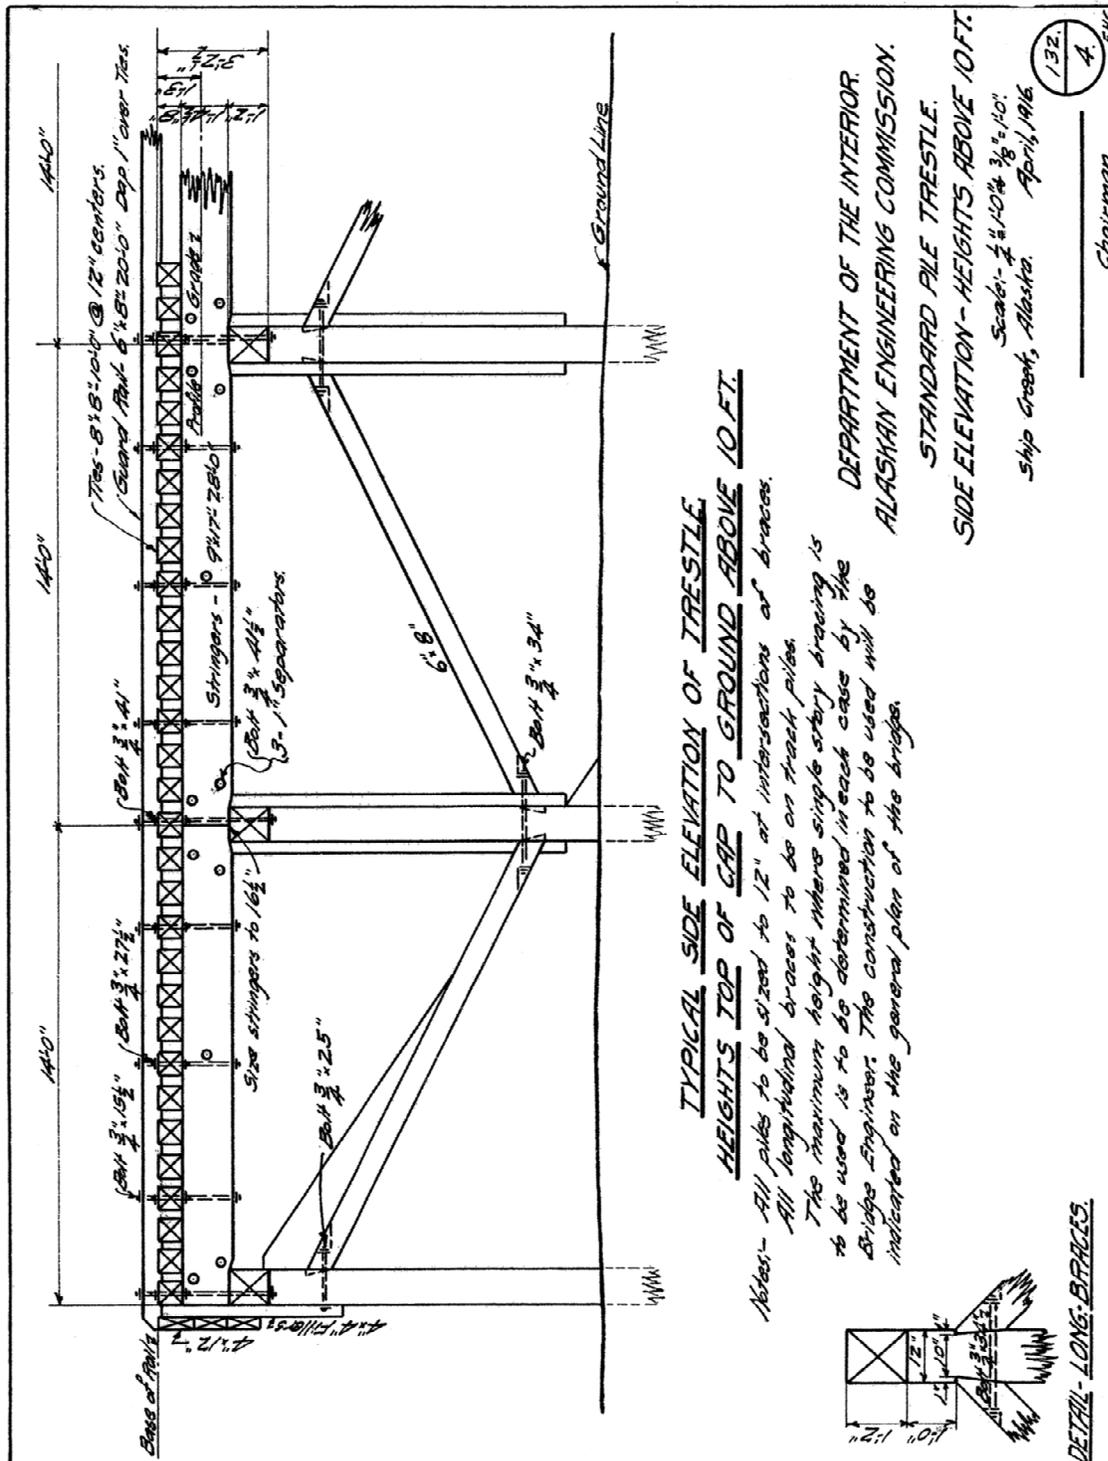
Standard Pile Trestle, Side Elevation. Heights Above 10 Ft, April 1916, Sheet 132.4.
